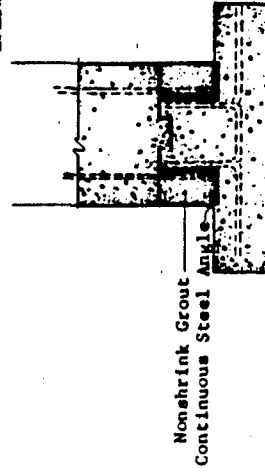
WALL-TO-ROOF FOUNDATION JOINTS.
